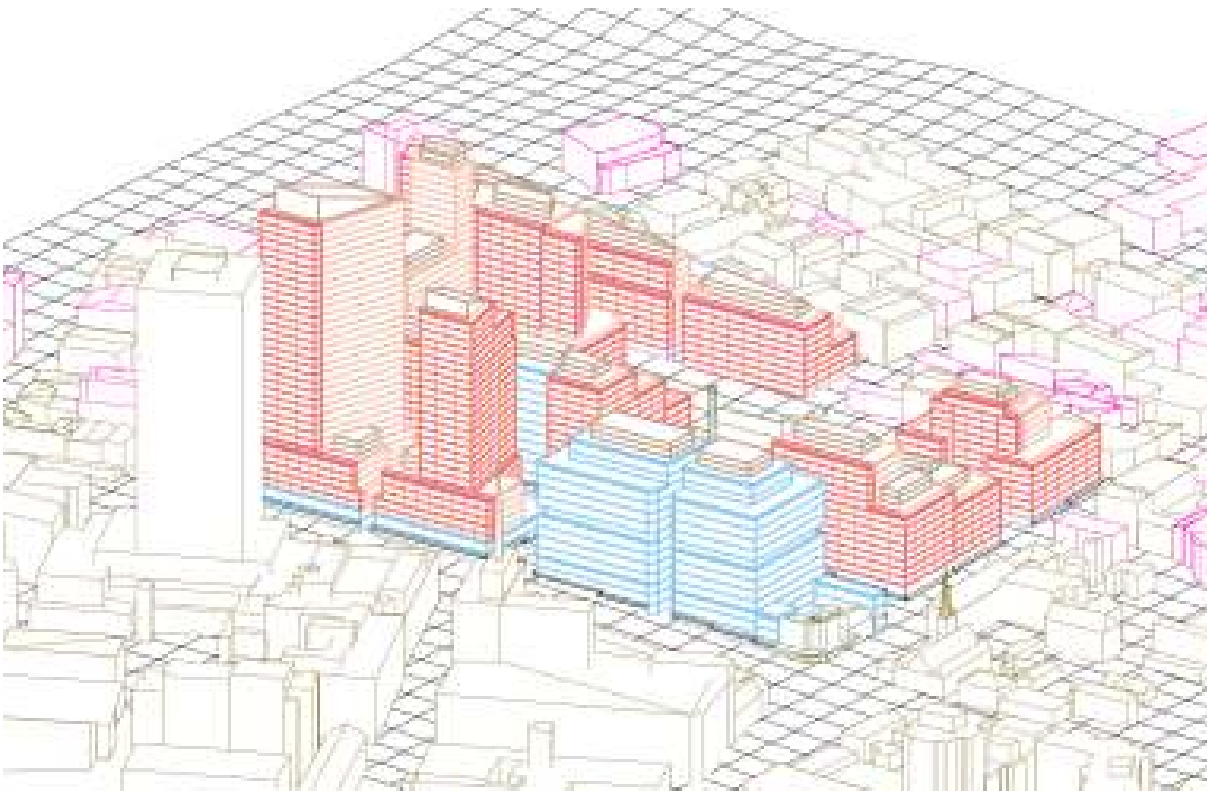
Aerial view looking southeast of CUB Site and building envelopes proposed in the Concept Plan as lodged. The buildings are coloured red and blue to denote residential floor space and commercial floor space respectively within the proposed building envelopes.
